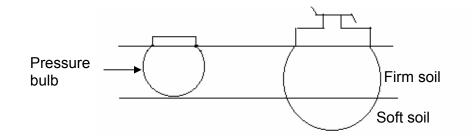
Pressure bulbs for the plate and the actual foundation.
